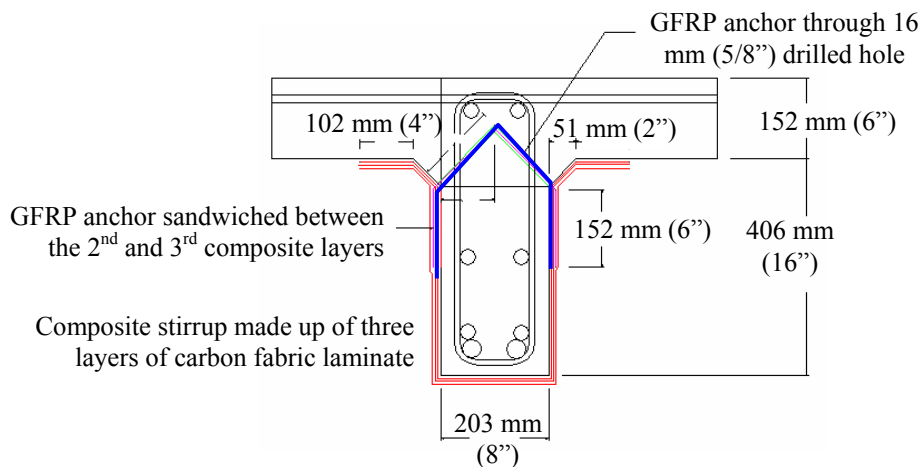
Schematic of cross-sectional view of strengthened girder
